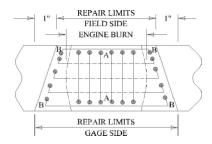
Diagram of Engine Burn Repair and Weld Weave Pattern
